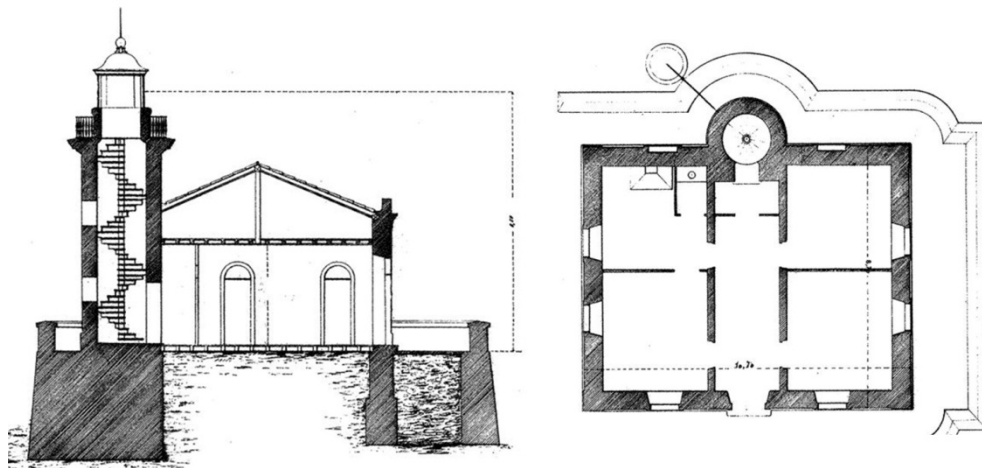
Longitudinal section and ground plan in the original Project, 1864
